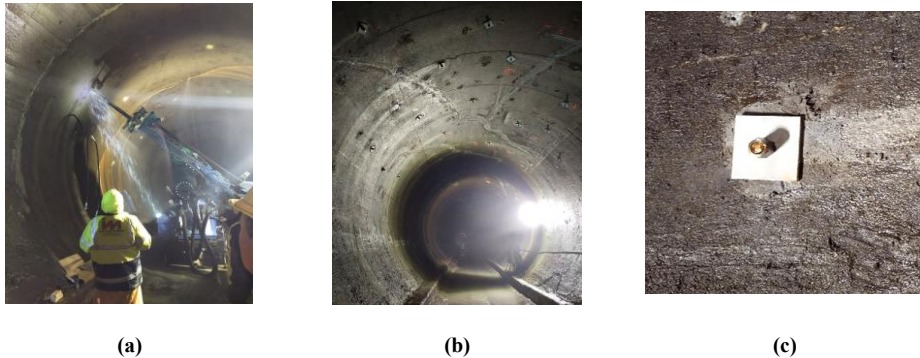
(a) Drilling of tunnel lining, (b) Appearance of tunnel lining after installation of anchors, (c) Anchor type “SDA”.
